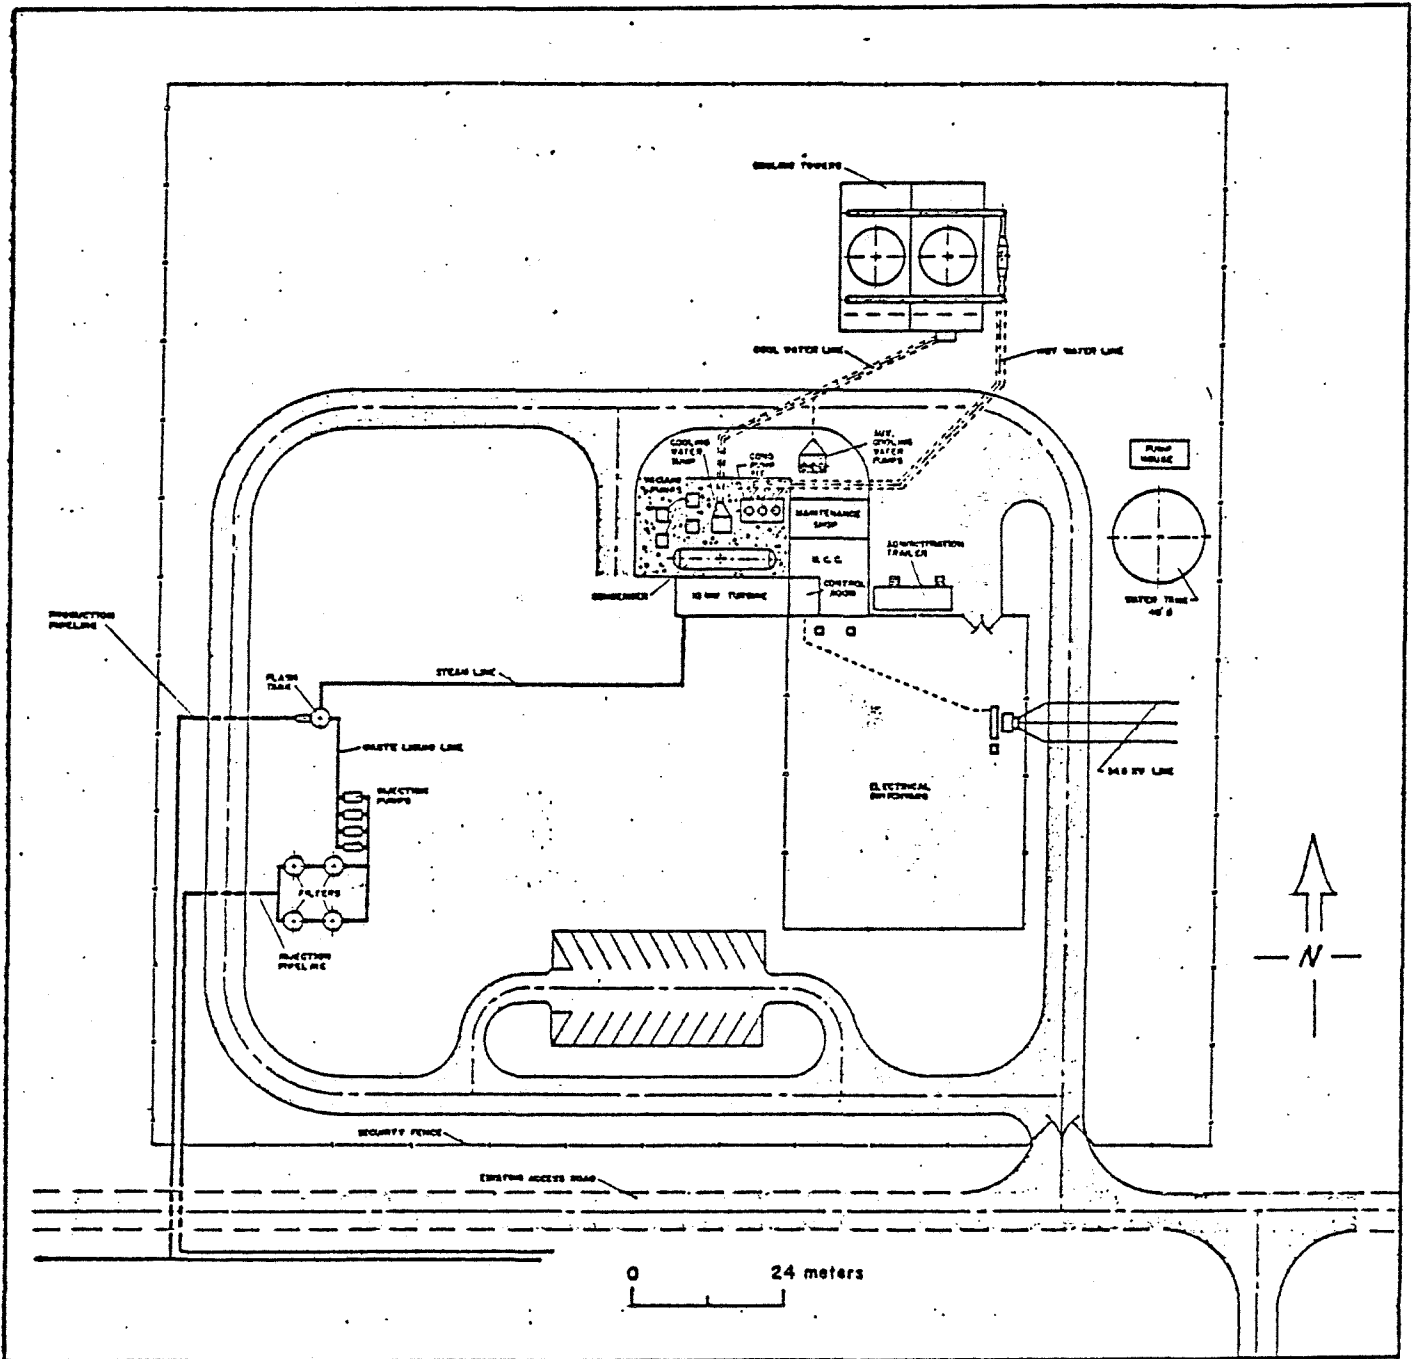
A possible plot plan for the Republic Geothermal, Inc's proposed 10-MW R&D power plant at East Mesa, California showing the facilities that would be used in the project. The configuration and layout of these power plant components would be subject to change although the boundary would not be modified (From RGI, 1977).
